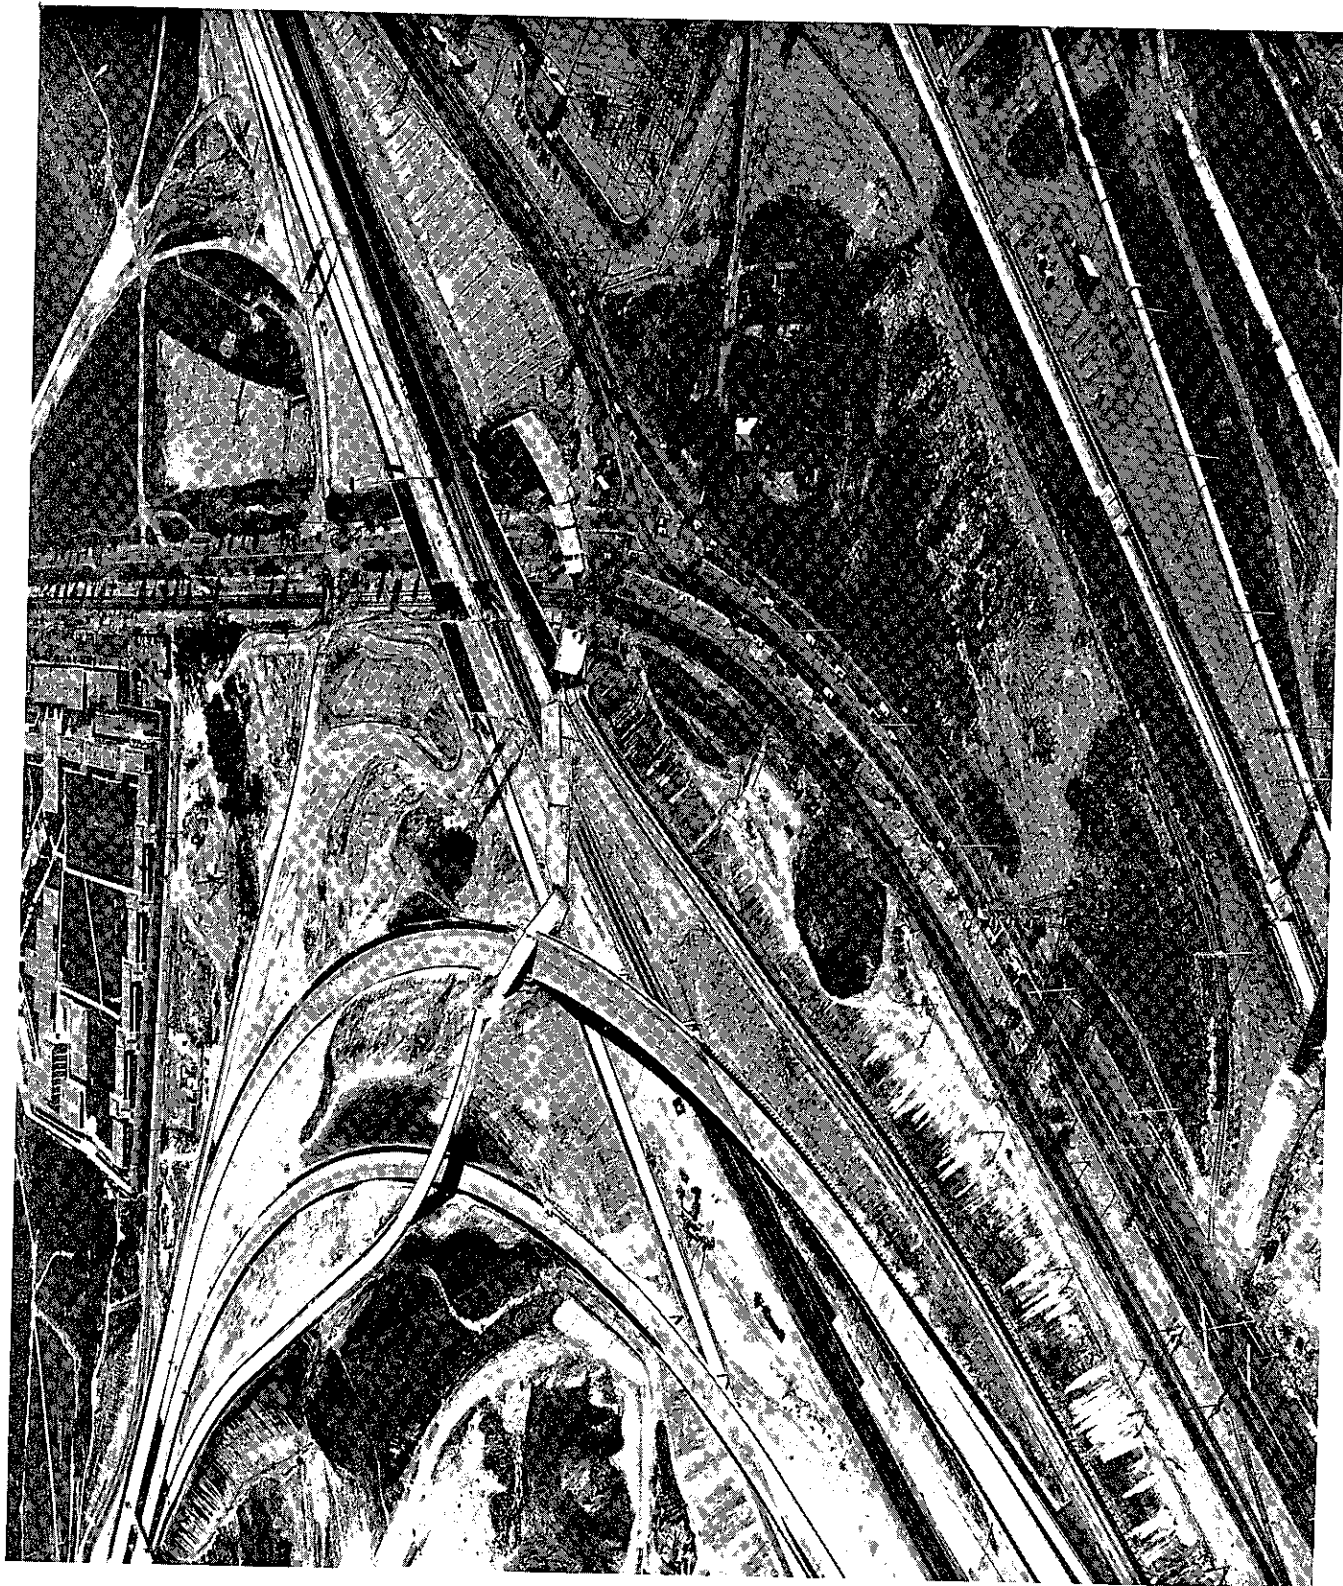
Aerial view of Route 5/210 Interchange showing damaged structures.
